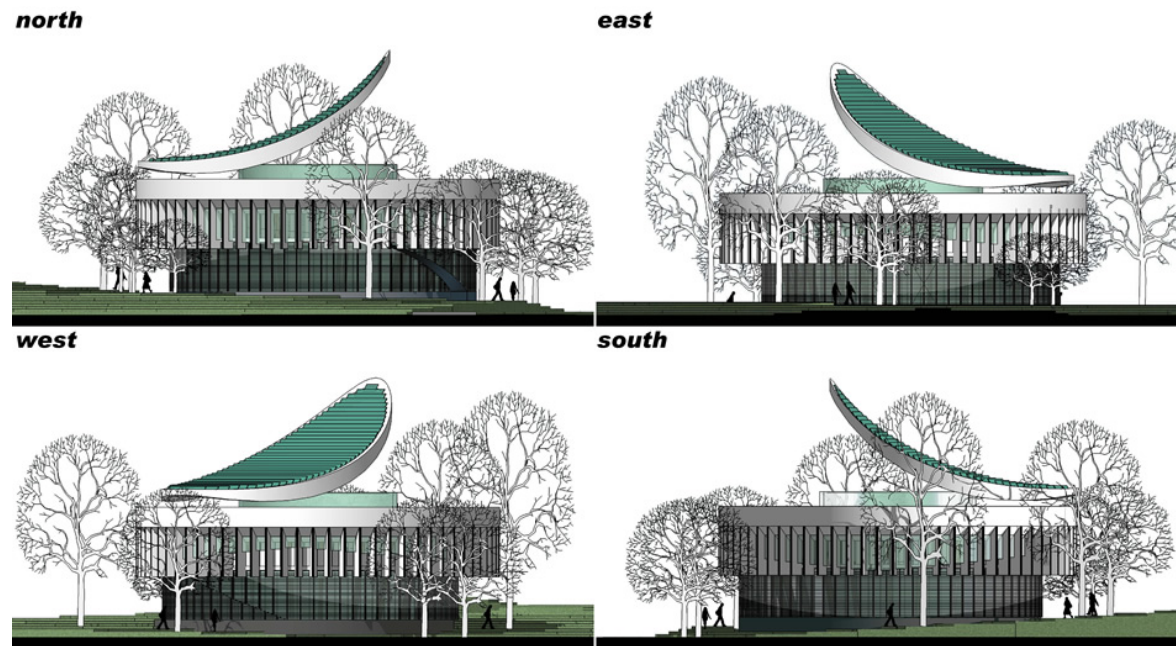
Variable window height over the perimeter of the building [illustration credit: Rudy Uytenhaak Architects]
